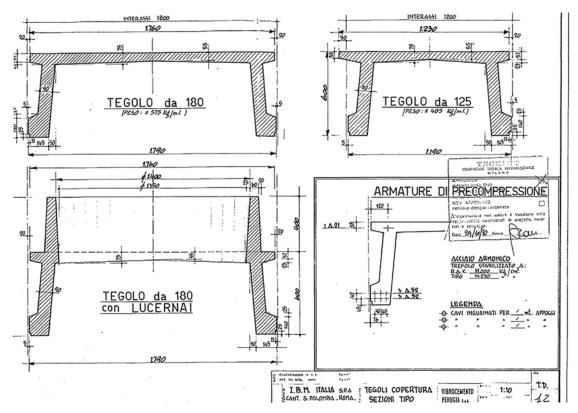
IBM Italia factory, a typical section of the roofing tiles. Source: courtesy Generale Prefabbricati S.p.A.
